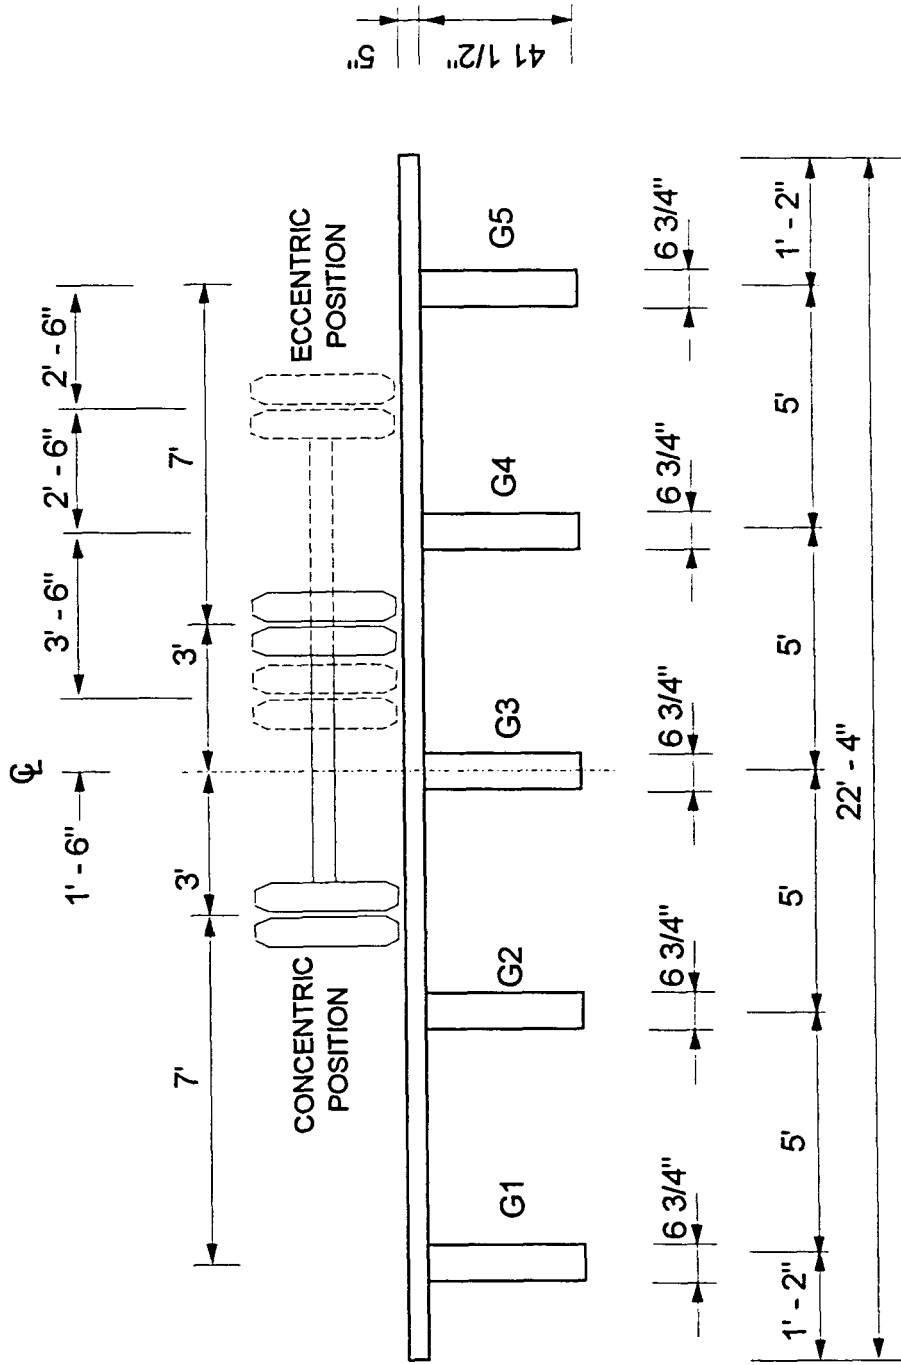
Mud Creek Bridge - cross section dimensions and transverse positions of the vehicle
